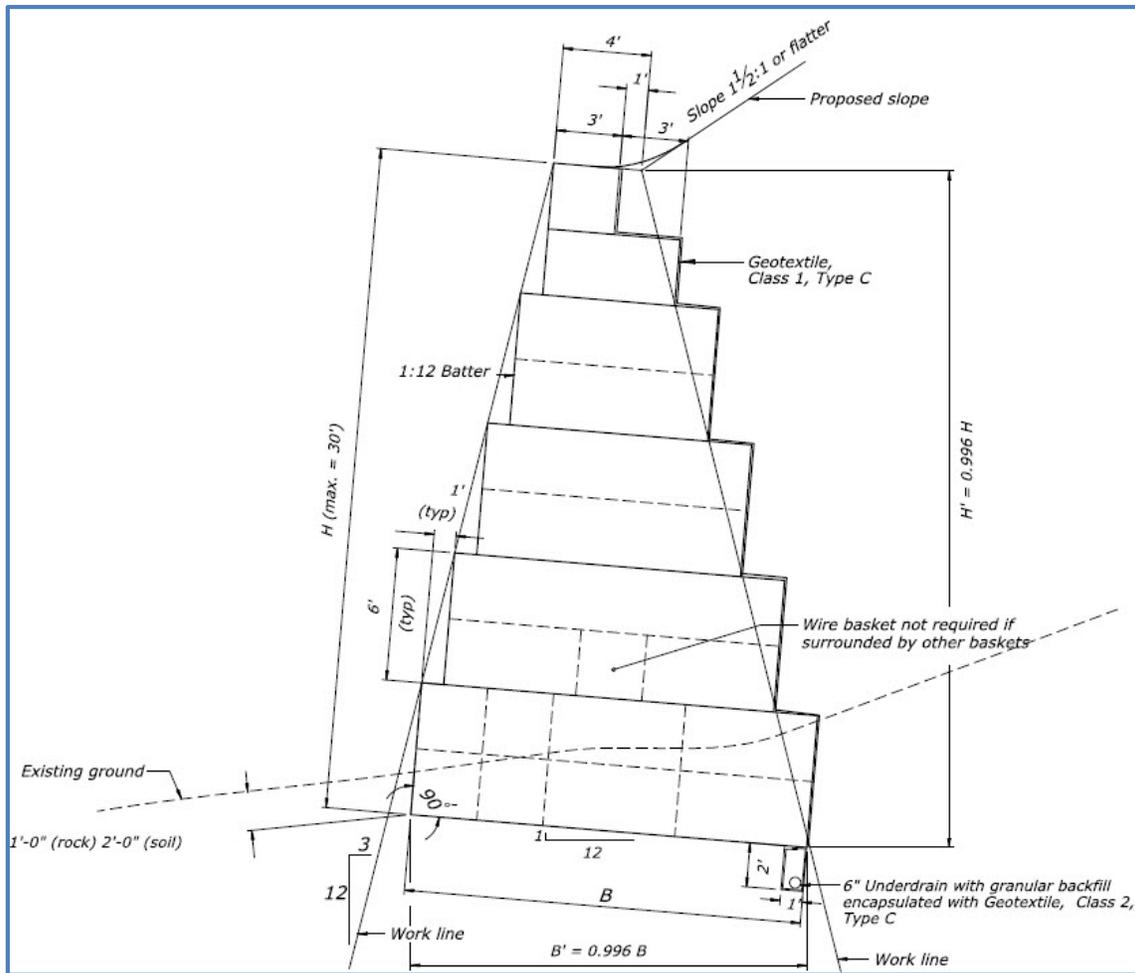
Cross Section of Gabion Retaining Wall (Conceptual)
